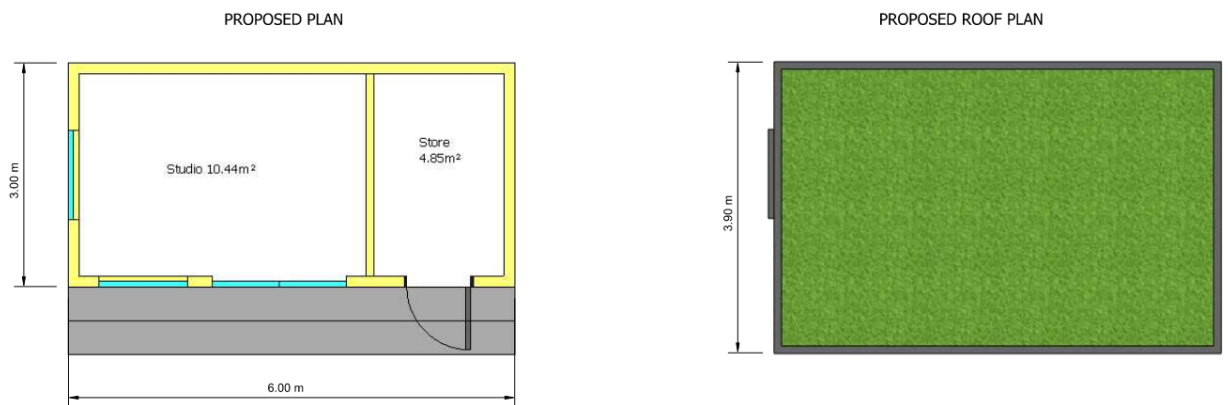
(above): Ground Floor and Roof Plan of Proposed Outbuilding (source: application drawings)
